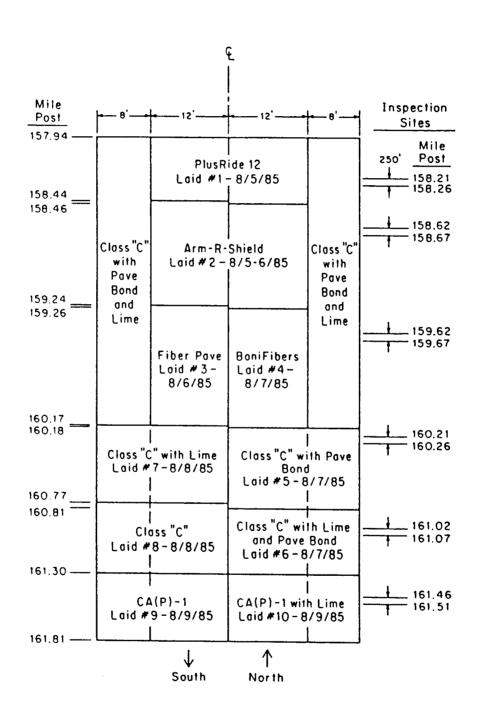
Layout of test sections in Oregon (Hicks et al., 1987).
